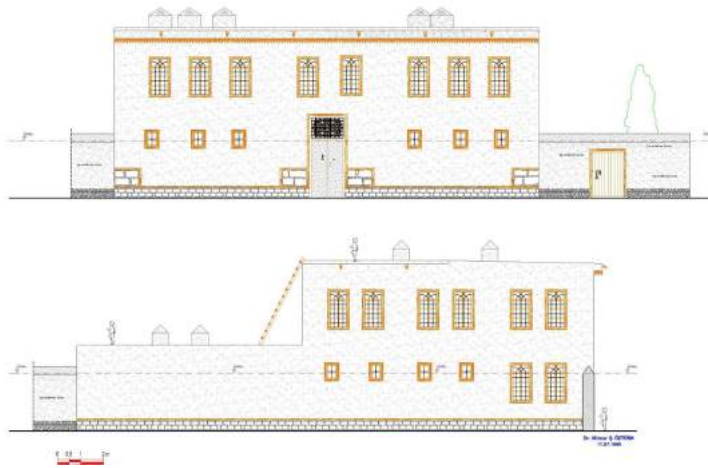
Polat Yörükoğlu House South-West Facade Restitution, drawn by author.
